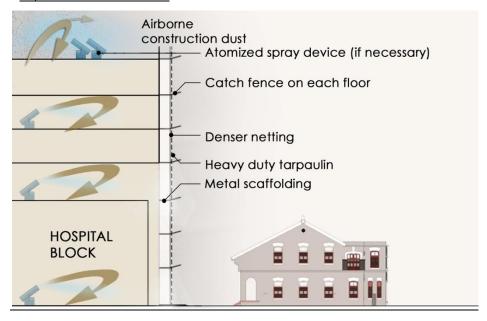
Additional protective measures against falling debris, concrete slurry run-off/spray & construction dust deposition
